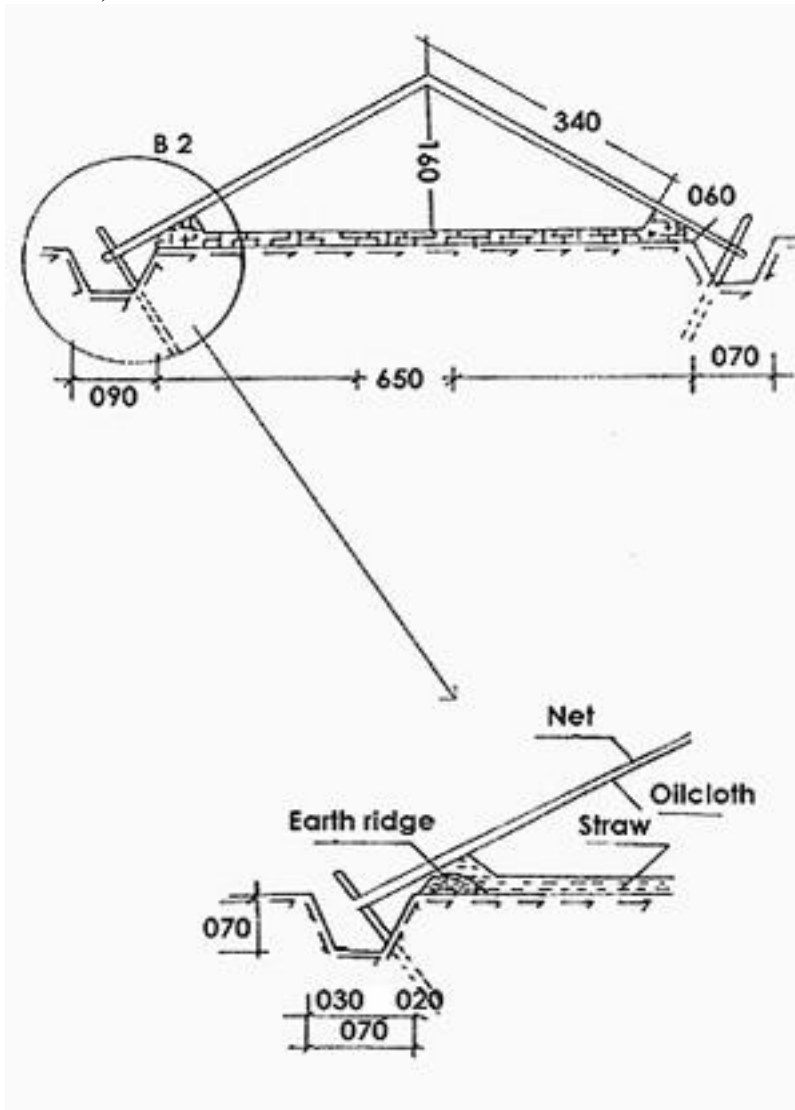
Vertical cross section of heap with oilcloth surrounded by earth pad
